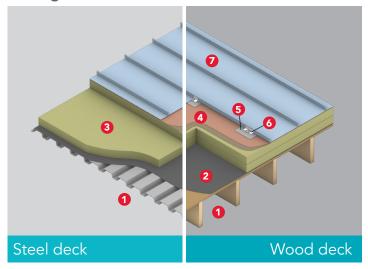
Architectural metal roof panel system using bearing plates as an attachment point for the anchor clips, over steel or wood decking
